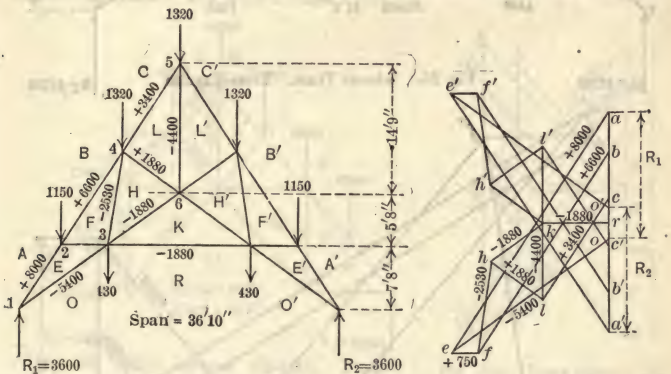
Scissors Truss. Truss-diagram. (See, also, Fig. 4 and Chapter XXVIII, Fig. 2) Fig. 24A. Scissors Truss. Stress-diagram
